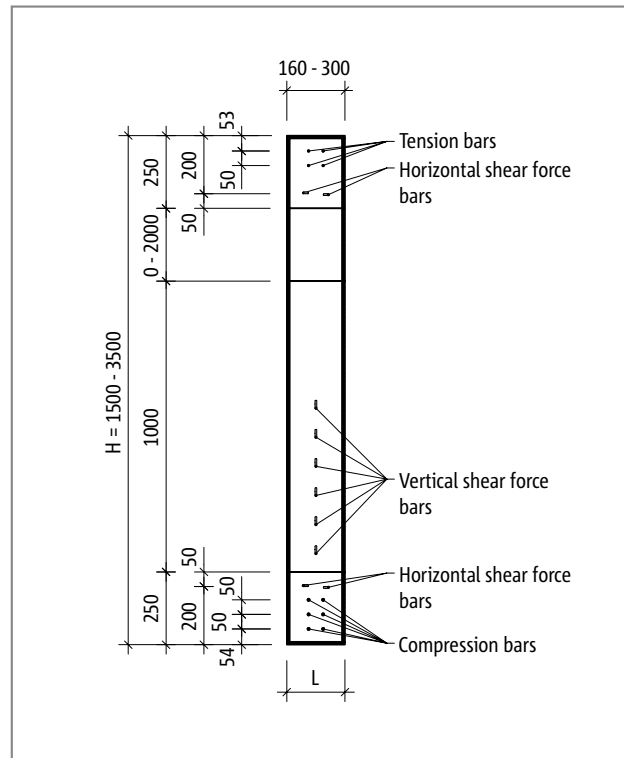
Schöck Isokorb® T type W-M1: Product layout
